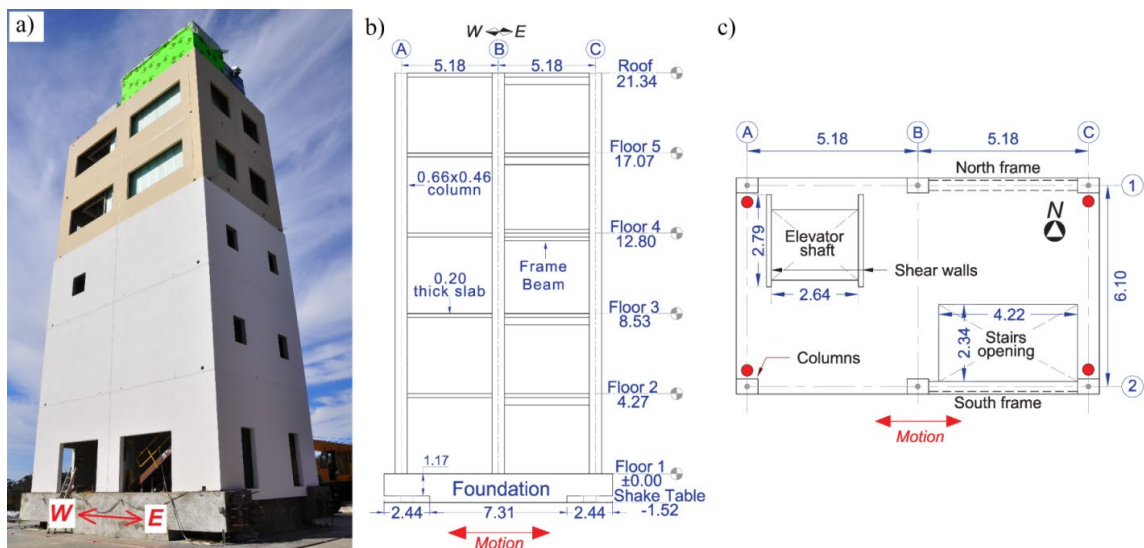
Test specimen: (a) completed building; (b) schematic elevation view; and (c) schematic plan view (dimensions are in meters).
